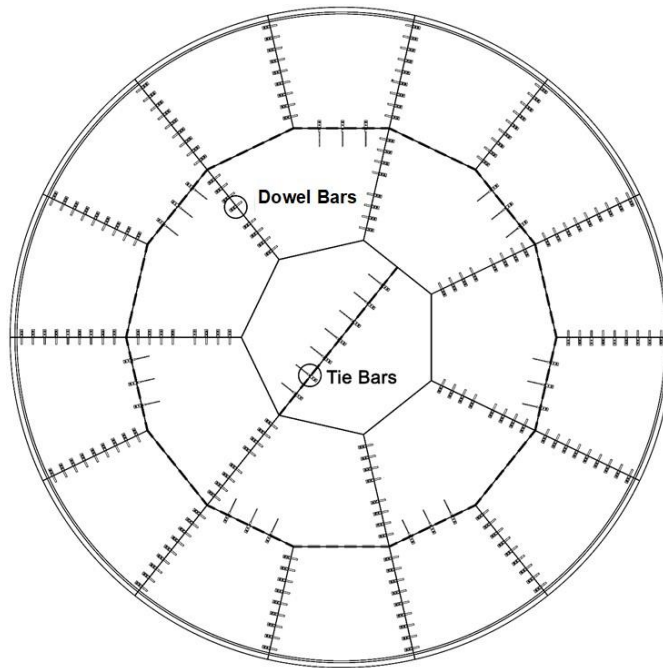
Panel Arrangement for Laburnum Avenue Precast Roundabout
